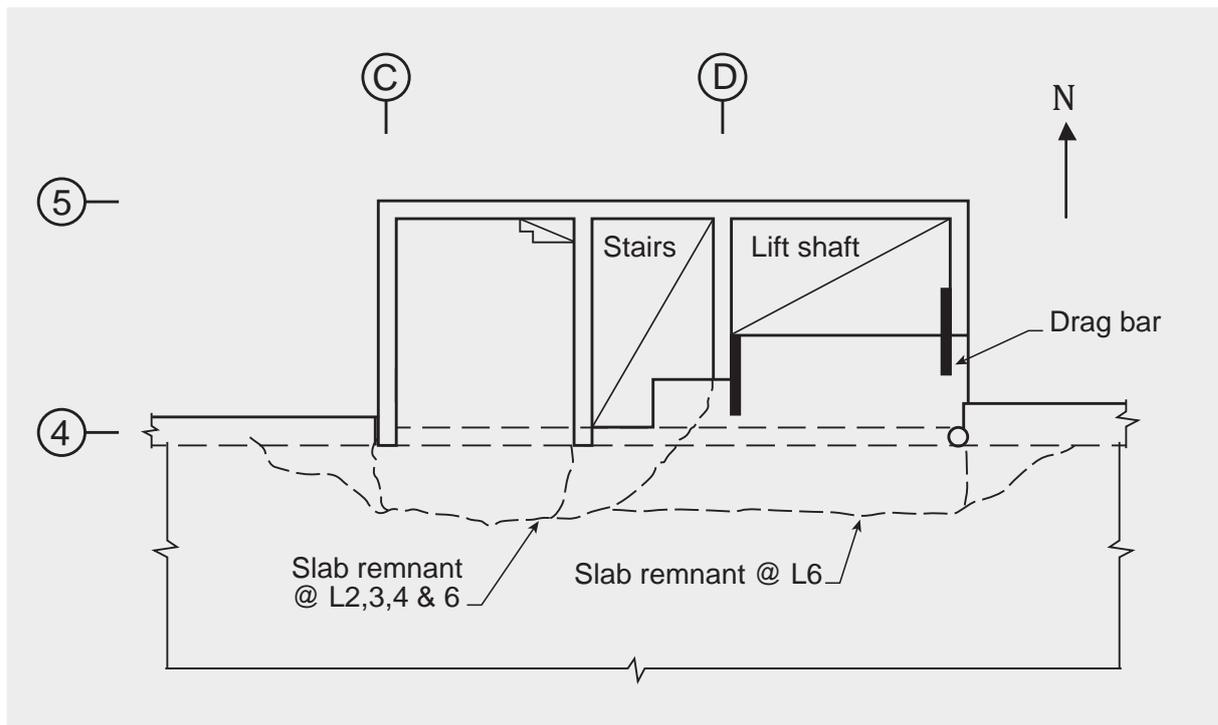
Remnant slab profiles at north wall complex after February earthquake (adapted from Figure 43 of the Hyland/Smith report)
